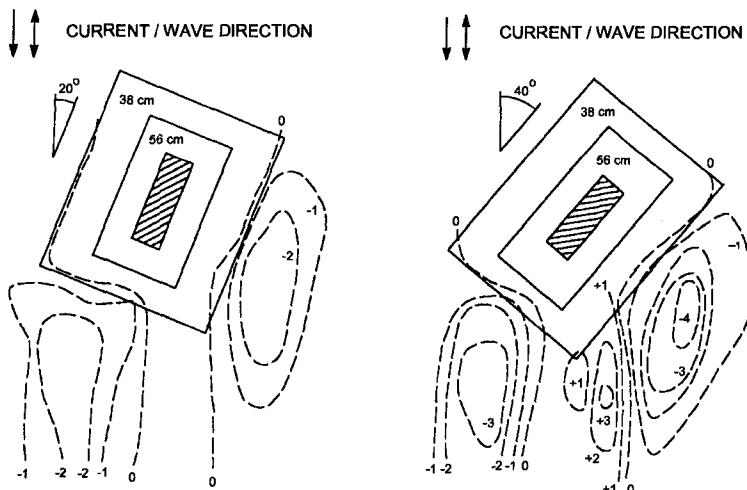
Typical damage pattern for 20° and 40° pier alignment.
